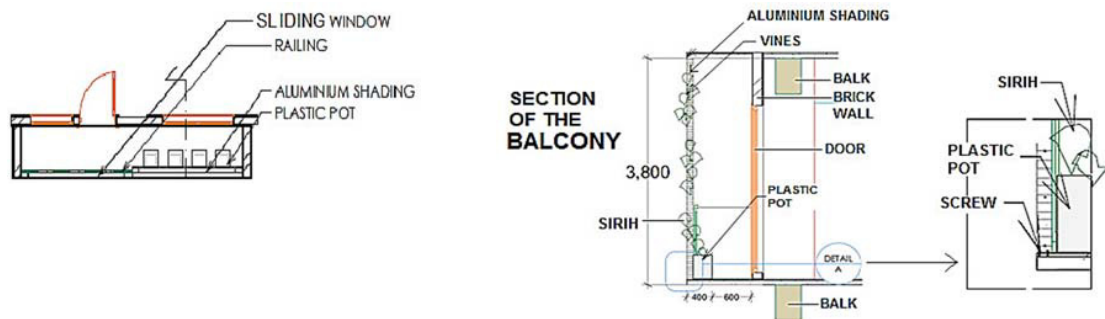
Balcony plan, balcony section and section of pot placing on the balcony
